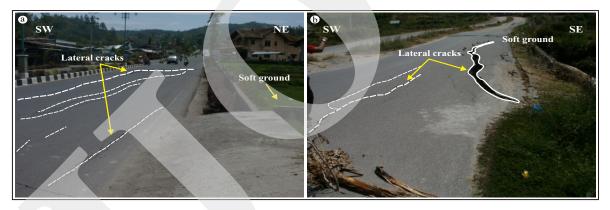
Photographs showing ground failures associated with lateral spreadings of road embankment around Takengon Town. (a) On the main road connecting Takengon Town and Bireun, (b) A lateral spreading on a new road connecting Takengon Town and Kute Panang.
